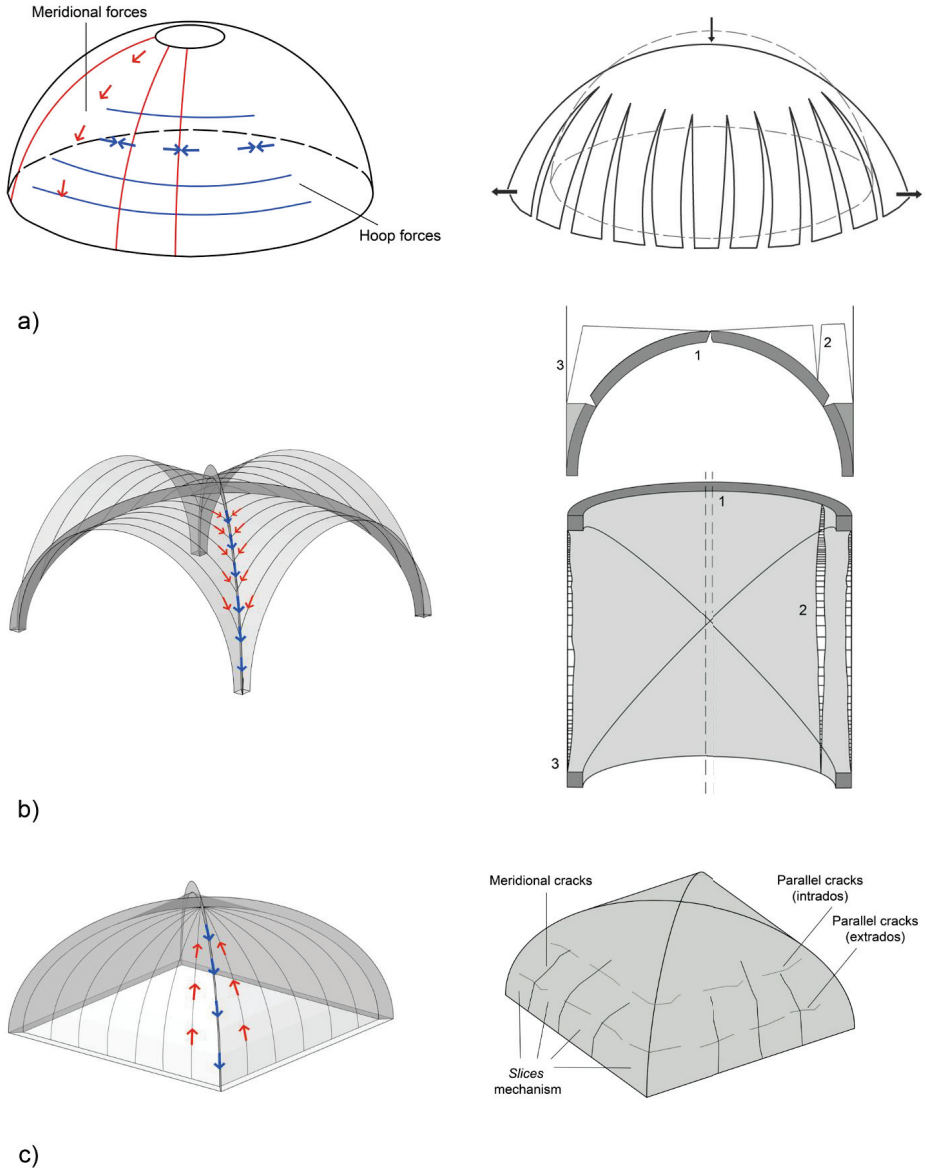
a) Dome, static scheme and cracks; b) cross vault, static scheme and cracks (1. hinging cracks; 2. Sabouret cracks; 3. wall cracks); c) cloister vault, static scheme and cracks. (De Matteis and Cacace, 2018)
